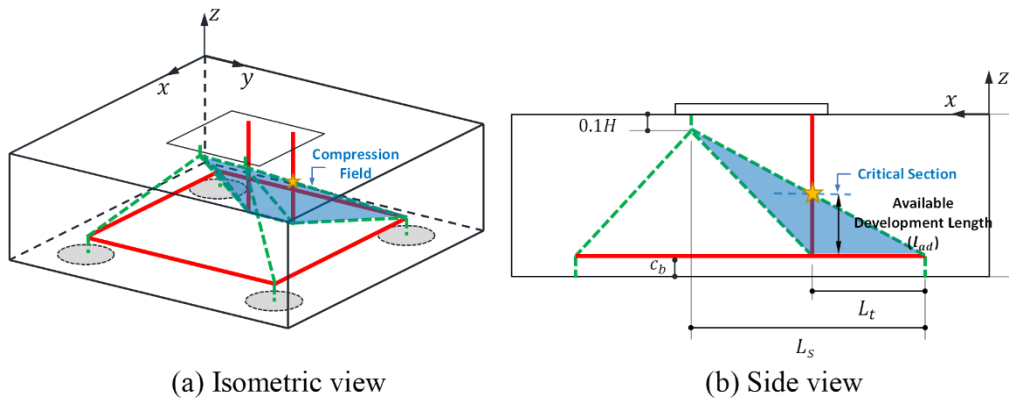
Proposed available length for anchorage of column reinforcement in drilled shaft footings (Phase II)
